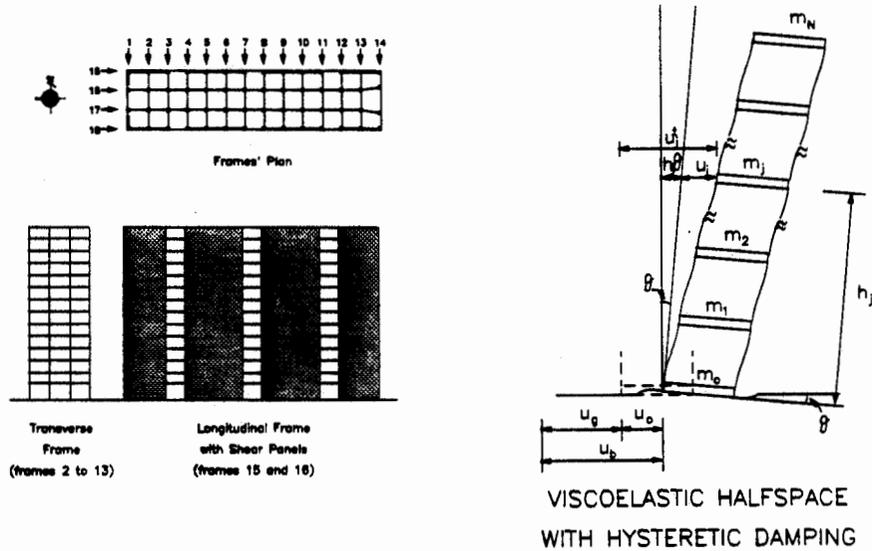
Mathematical Model of 14-Story Warehouse Building. (a) Building Superstructure, (b) Building-Foundation-Soil System.
